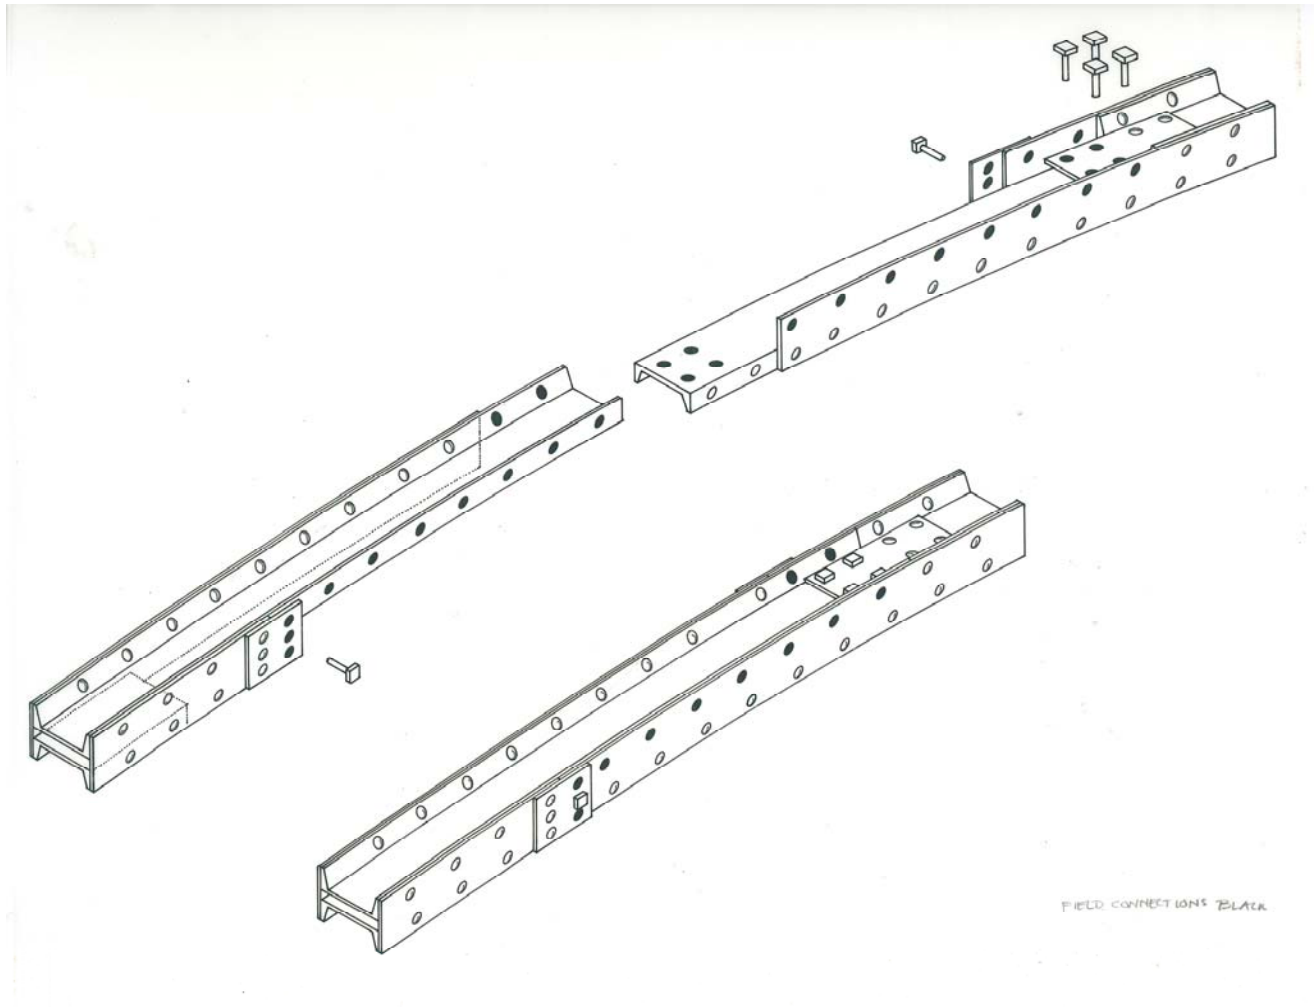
Zenas King used a more elaborate system to connect the four sides of his bowstring tubes during field assembly that required using threaded bolts to temporarily hold the segments in position until the tube was fully riveted. This explanatory drawing, showing the original square-headed bolts, was based on the shorter bowstring now standing at the Ohio History Center in Columbus and thus has a much-reduced cross section in comparison to the Sidney example. Drawing by Elaine Pierce, David A. Simmons Collection
